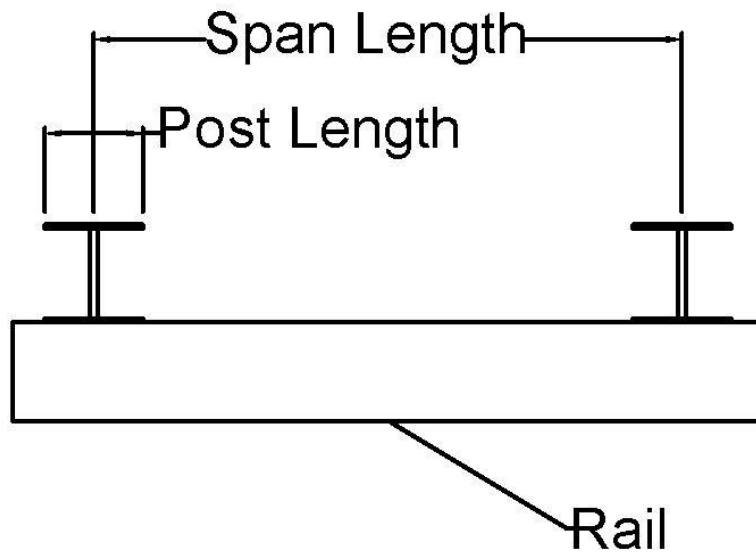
Steel Bridge Rail General Dimensions, Plan View
